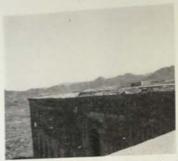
Group 16, Building 1, looking merth on the looking merth of east wing, showing buckled roof slab, pages 108.—Group 16, Building 2, top of south wall of east wing, showing buckled roof slab,
